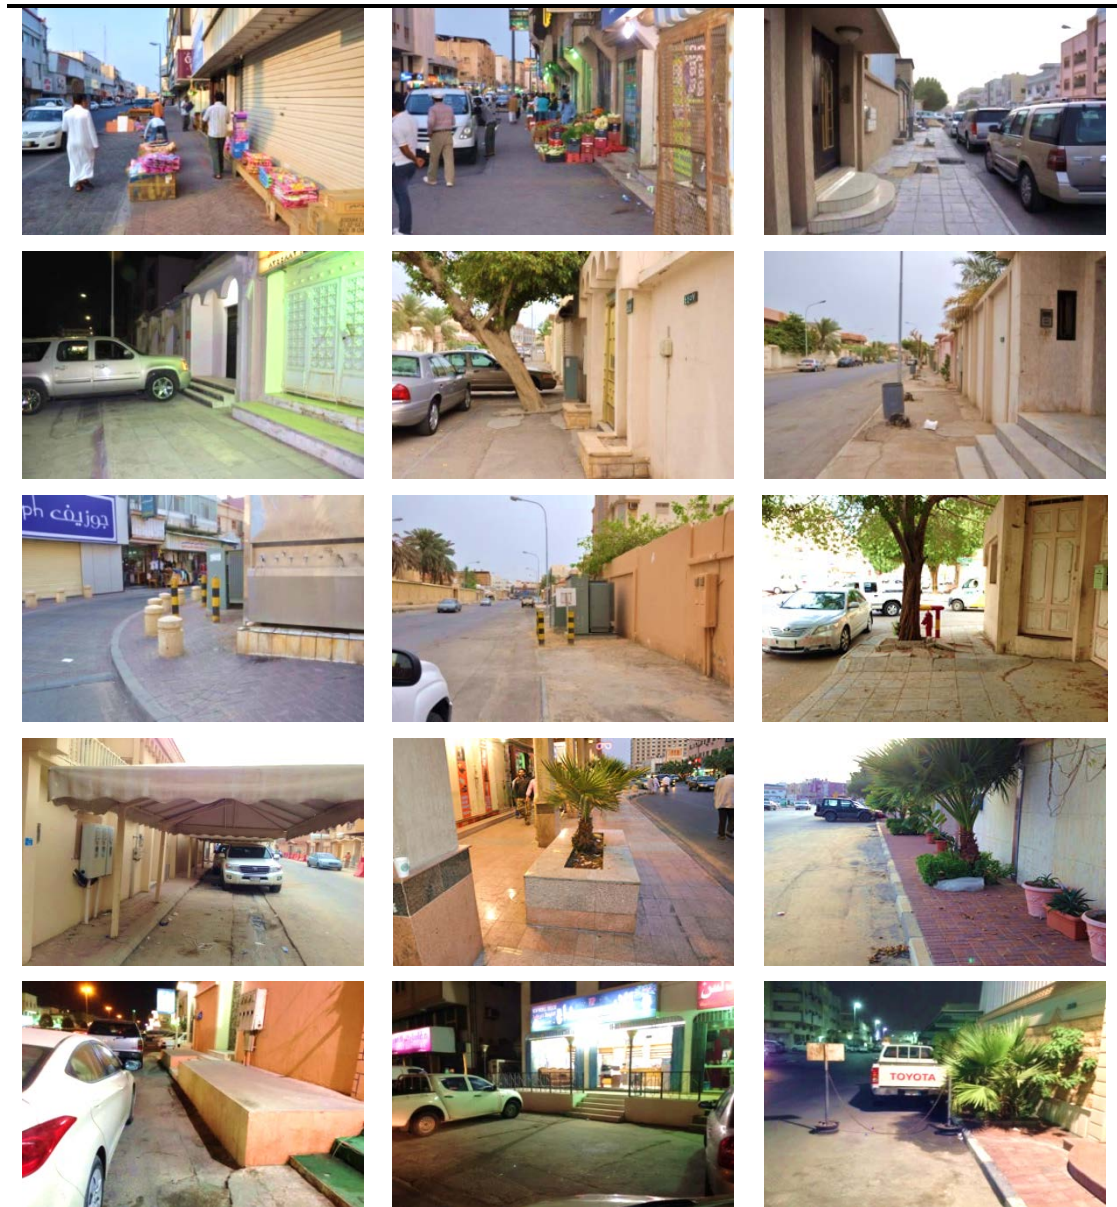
The lack of pavements, poor conditions of the existing ones or encroachments on their space very often force the pedestrians to walk onto the road surface (Source: the author)
